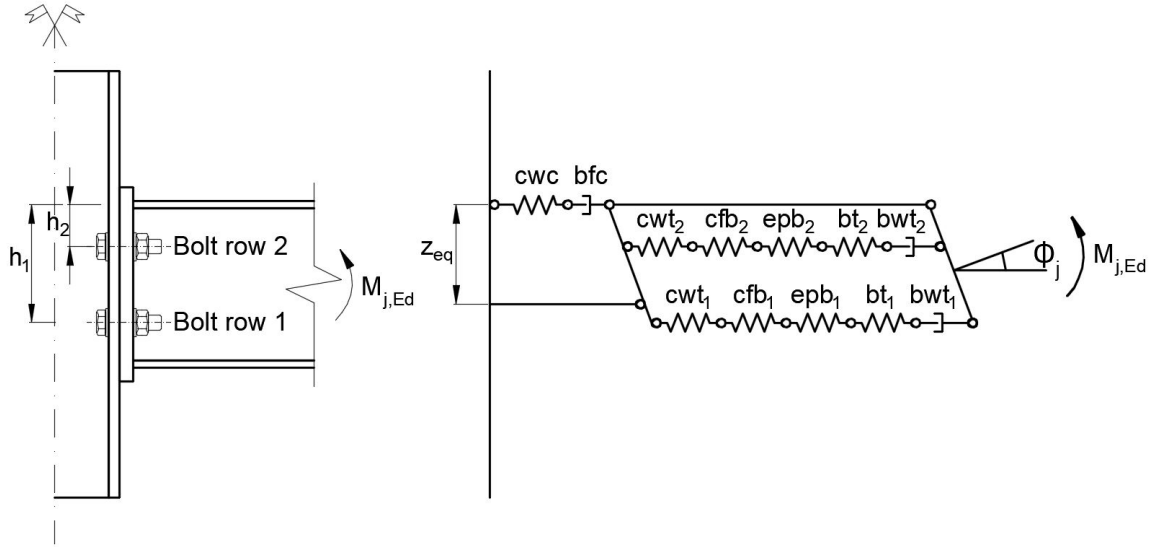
Mechanical model for bolted specimens (RJ, EPB and CFB)
